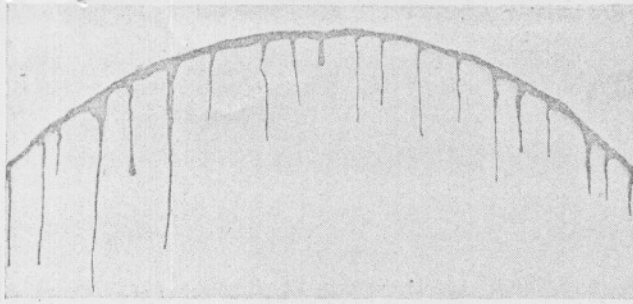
TYPICAL CONDITION OF FLOW FROM CRESTS OF CORRUGATIONS IN THE TOP QUARTER INSIDE THE CULVERT PIPE.
